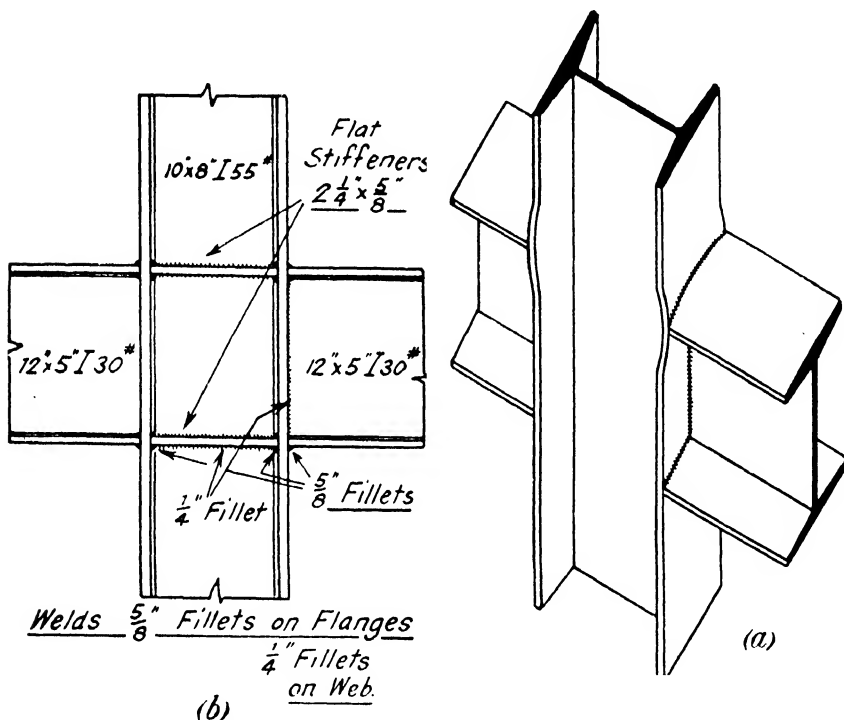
RIGID BEAM-TO-COLUMN CONNECTION FOR INSIDE COLUMN
